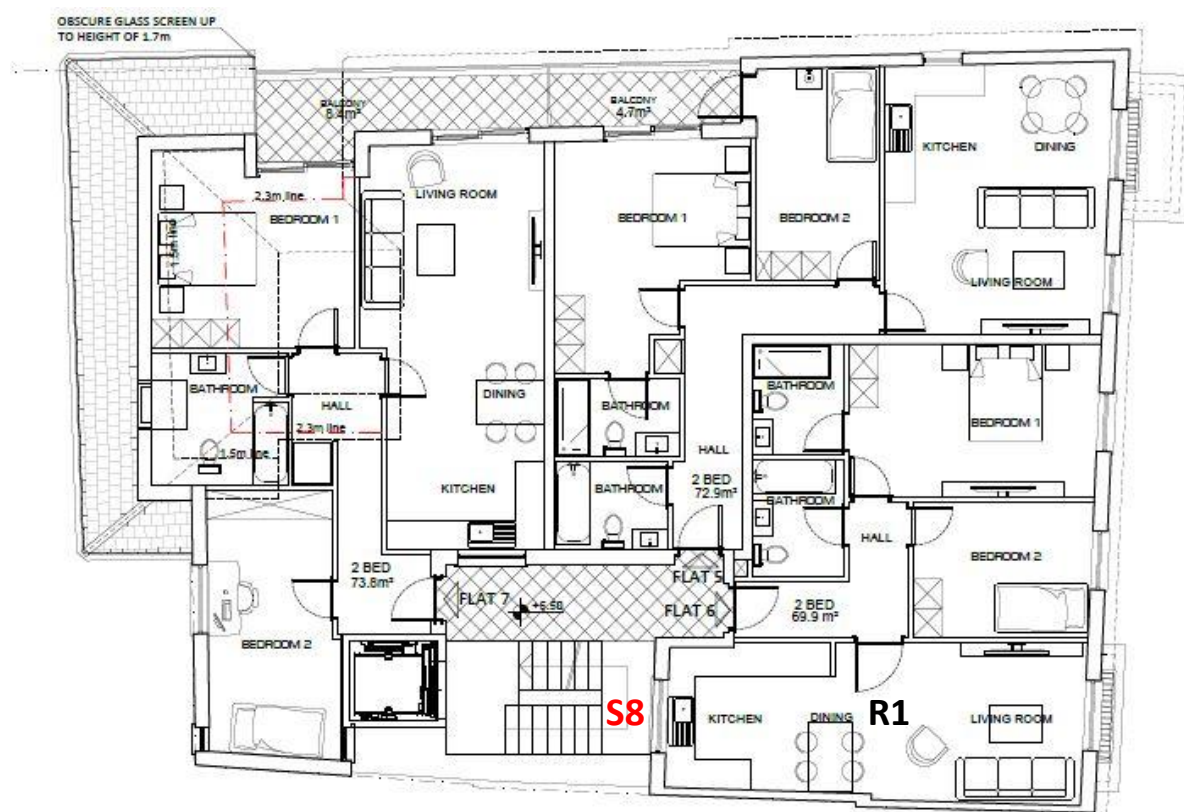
The 2nd floor plan at 5-7 Parson Street (ref. 16/5966/FUL)
